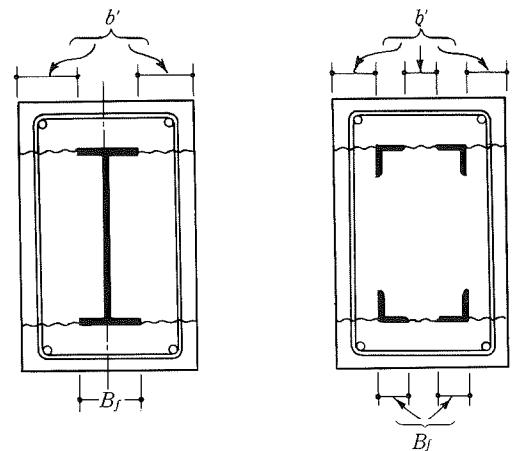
Effective Concrete Width  $b'$  at Steel Flange of Beam
